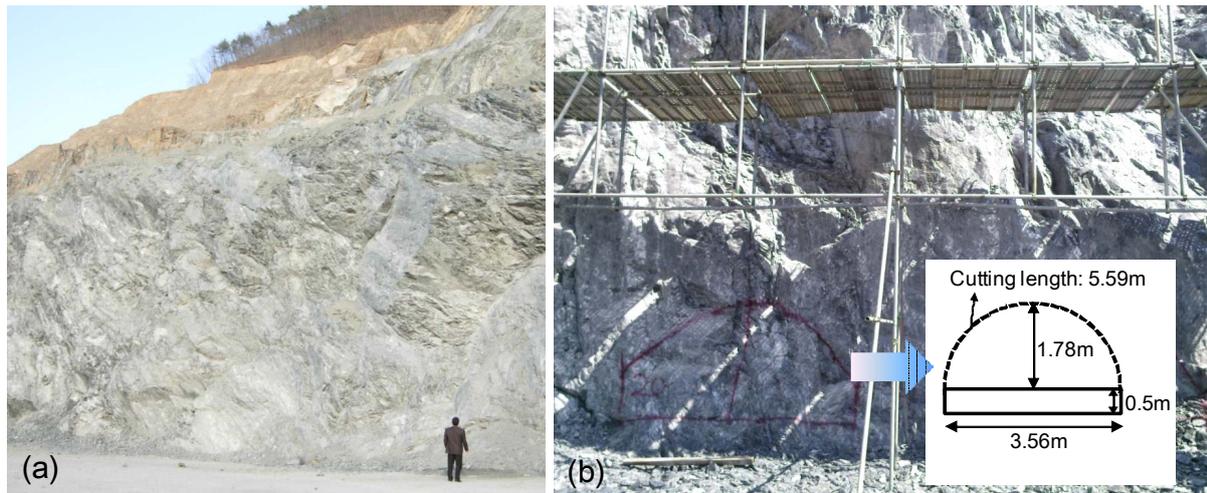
Field test site: (a) front view and (b) target tunneling dimension
